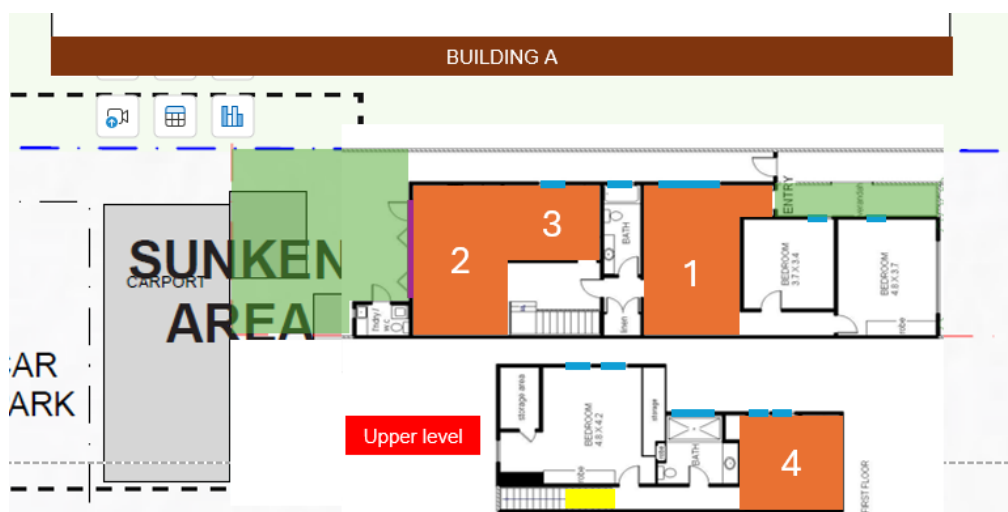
Actual floorplan of our house (including the upper level) and their interface with Building A
